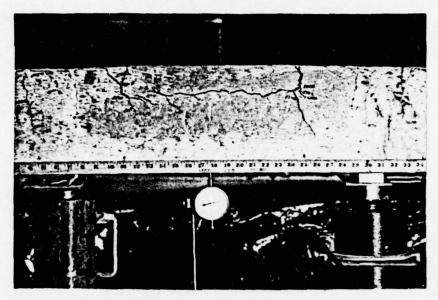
Failure of Beam T-5-P. Ultimate load = 8.75 kpj. Splice length = 14 inches.
